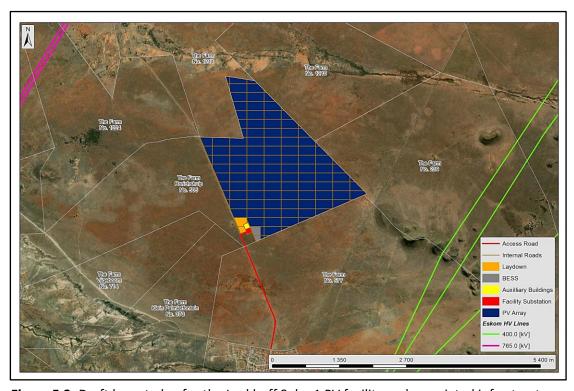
Draft layout plan for the Luckhoff Solar 1 PV facility and associated infrastructure
